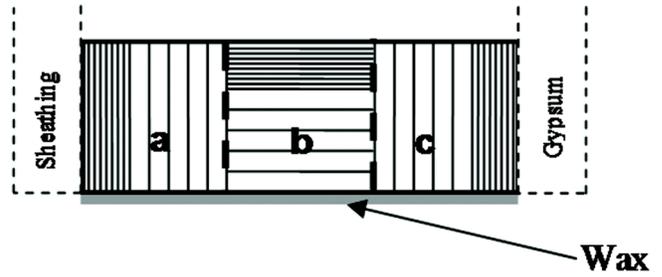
Slicing scheme for wetted bottom plate gravimetric samples, where parts A face the sheathing, parts B face the insulated cavity, and parts C face the gypsum.
